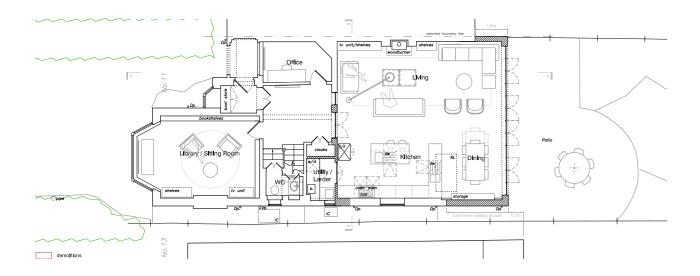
Proposed Ground Floor Plan - 11 West Heath
